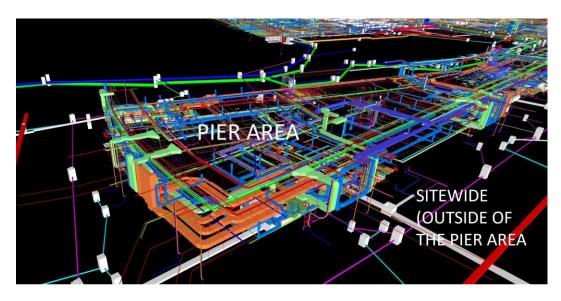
Viewpoint of the Merged MEP-Infrastructure IST BIM Model Focusing on a Pier Building Area
